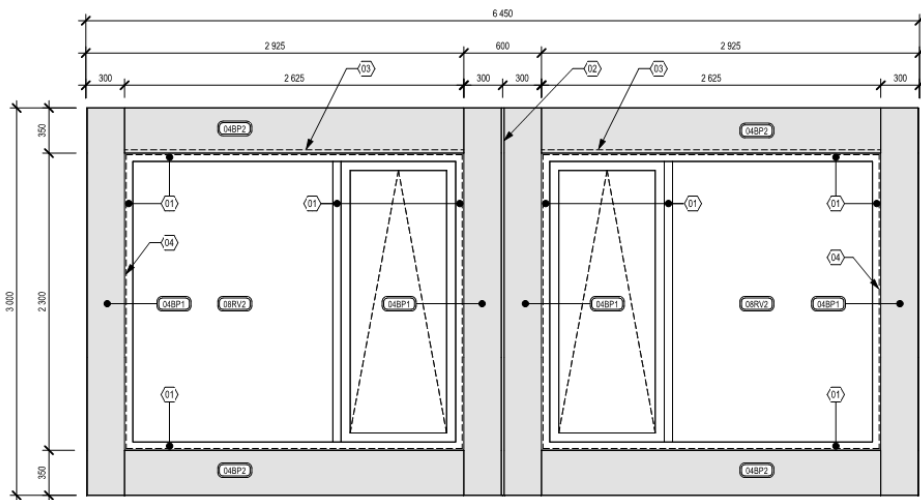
Double wythe precast panel—window head/sill connection.
